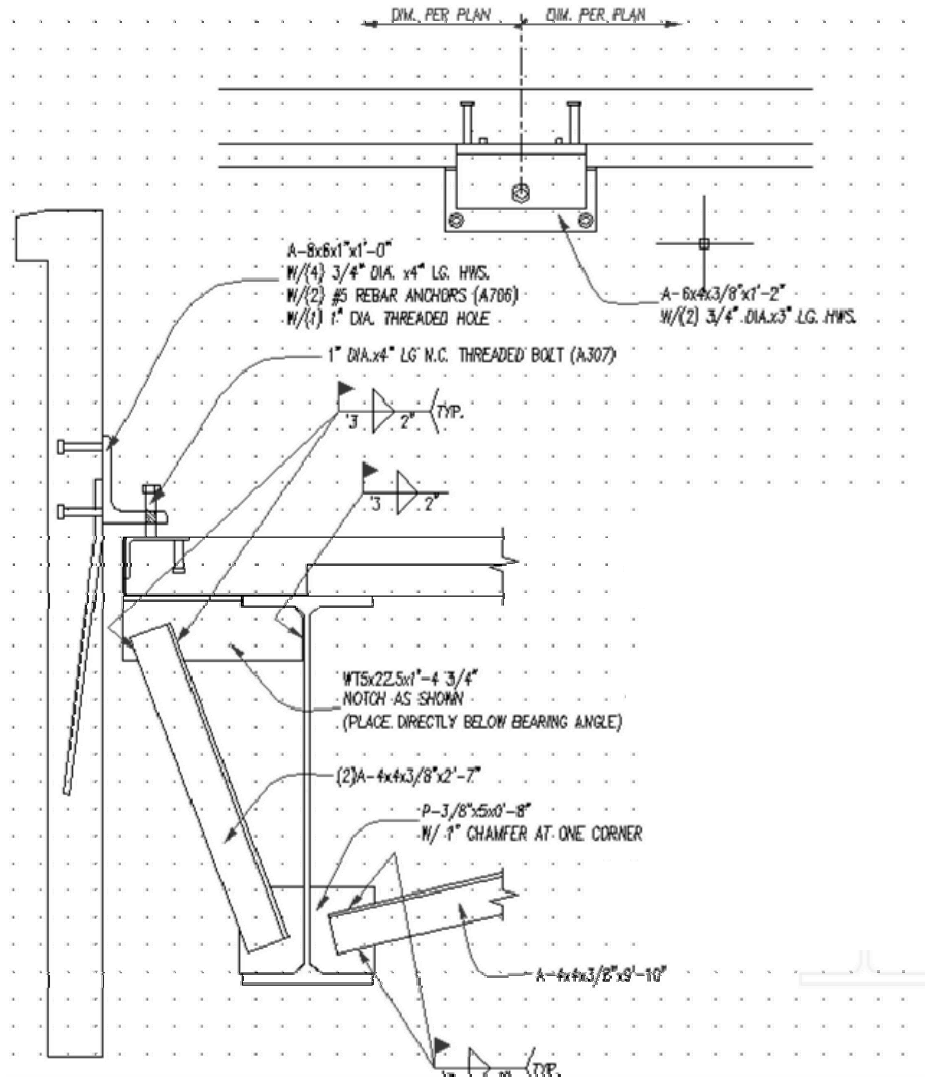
Plan (above) and section (below) of vertical bearing connection
